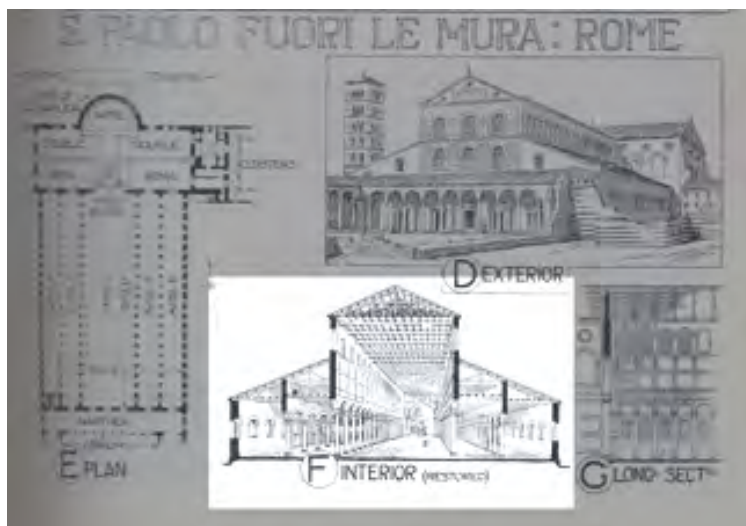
Inspiration for the plan – Early Christian basilica building type. Illustration and architectural drawings that follow are courtesy of Jim Owens.
